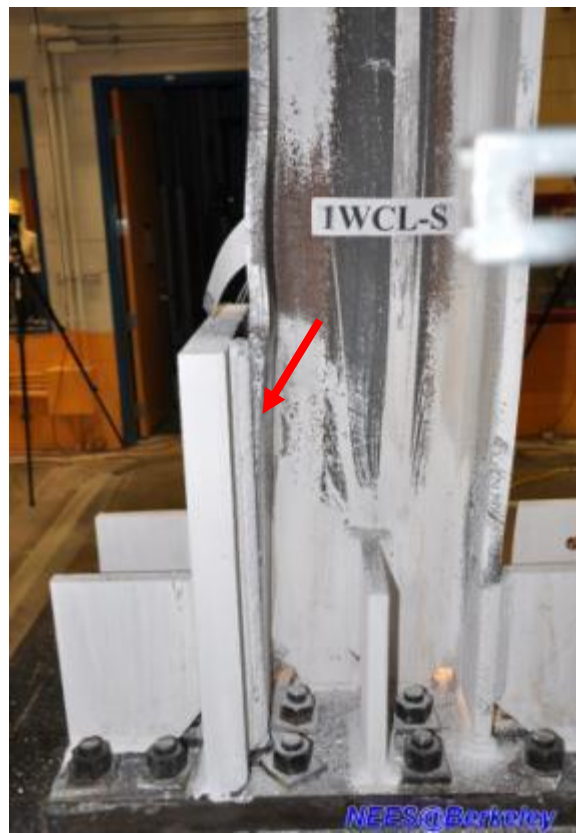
Specimen TCBF-B-2: tearing of vertical fillet welds at west column base.
